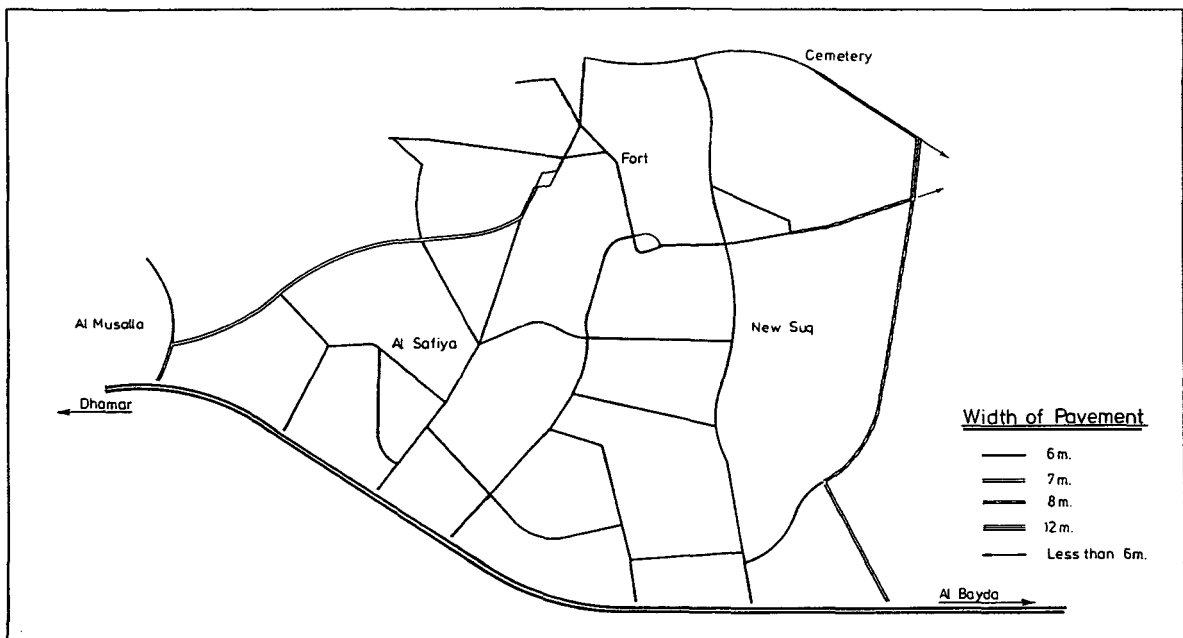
Lay-out of stormwater drainage system, with road widths
